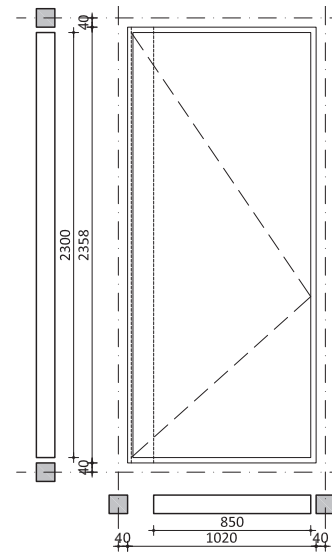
Example of a curtain wall door compliant with the minimum door requirements (type D-SS D1).
